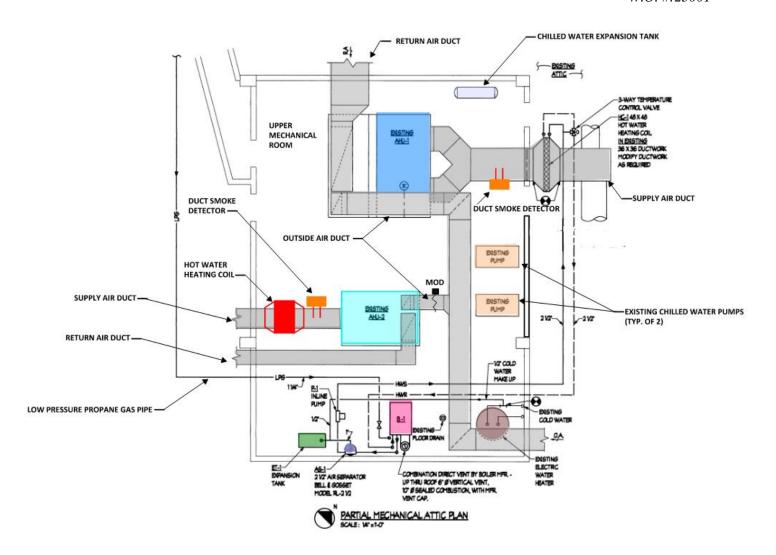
Mechanical Attic HVAC Equipment Approximate Locations
